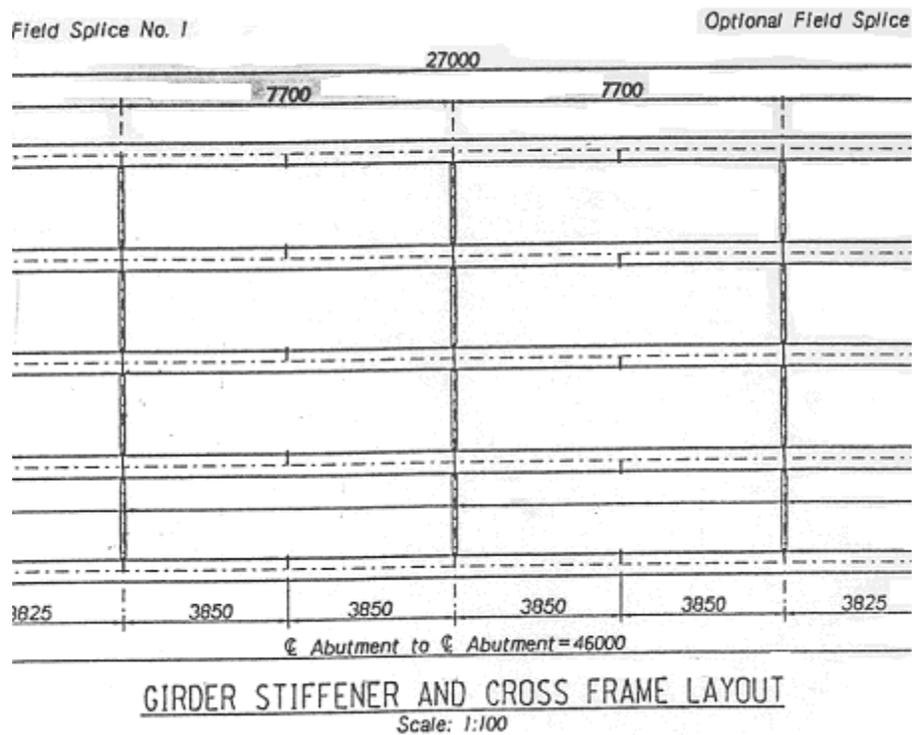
South Snyder River Bridge cross-frame spacing.
